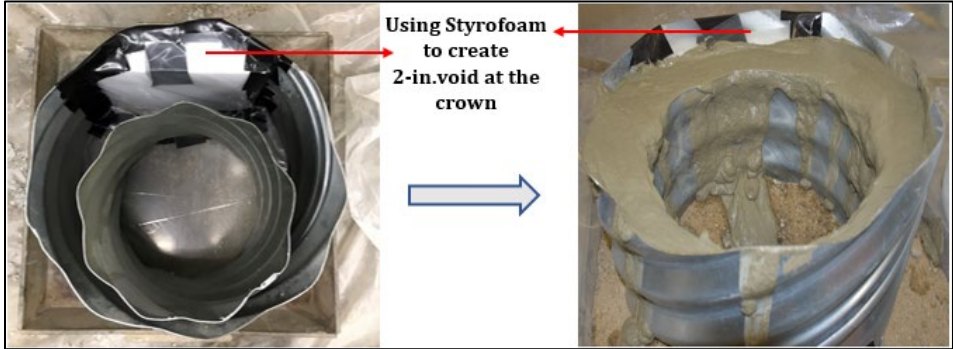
Preparation of Crown Void in the Sliplined Culvert Test Specimen.
